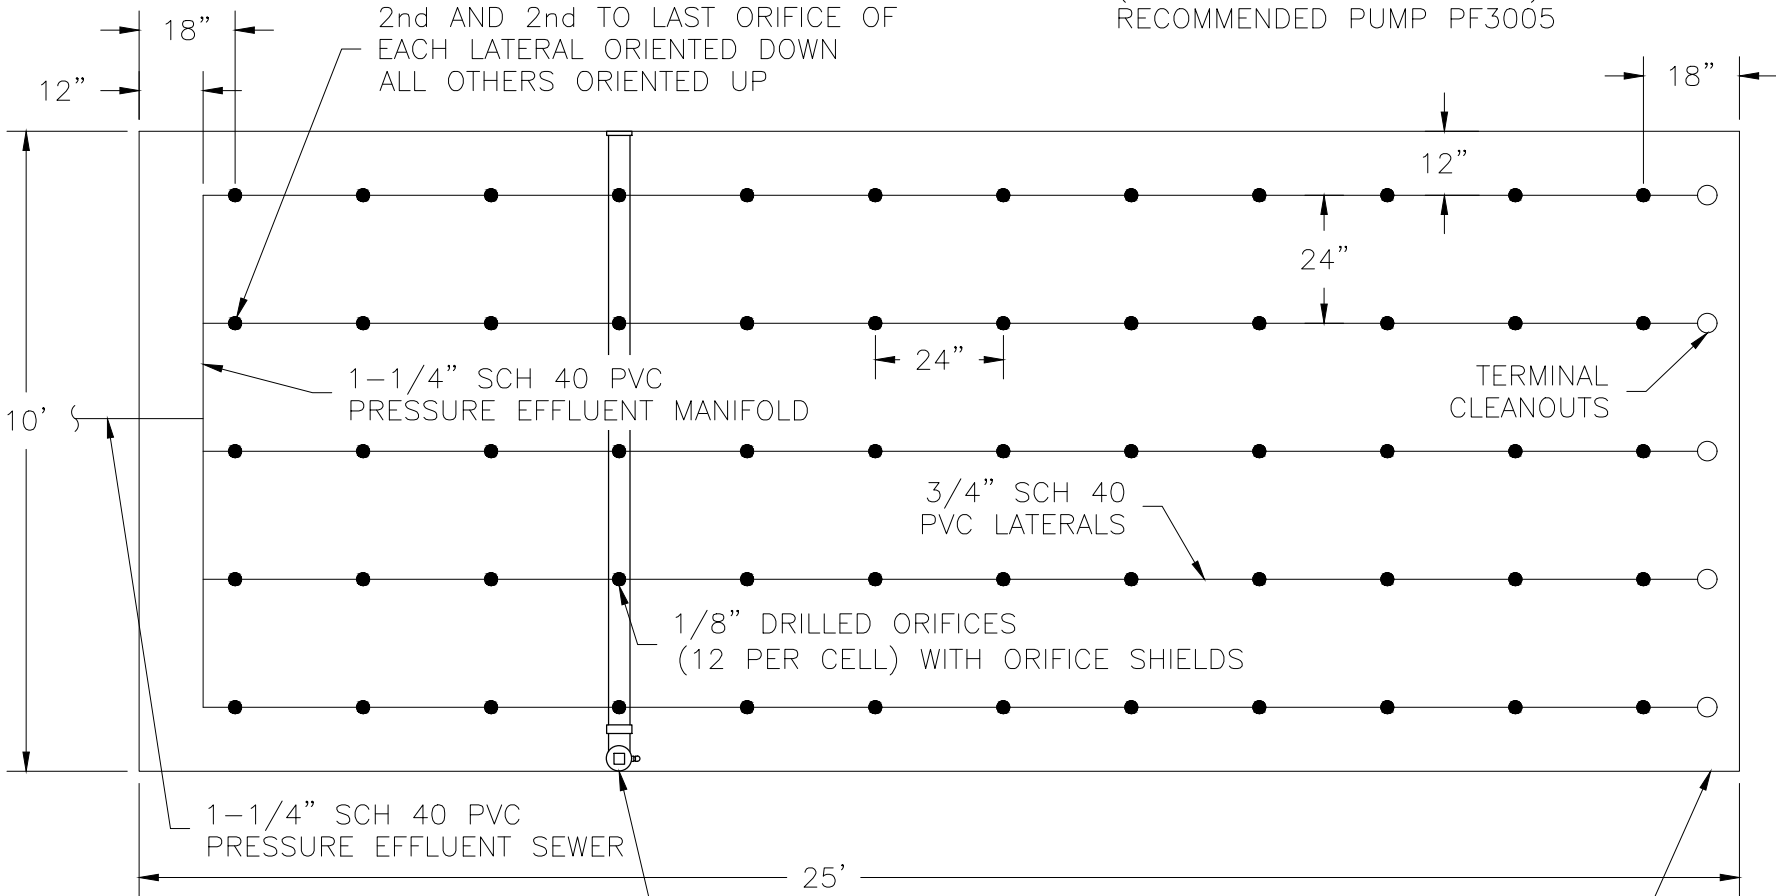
B. Modified Bottomless Sand Filter Section – Replacement
